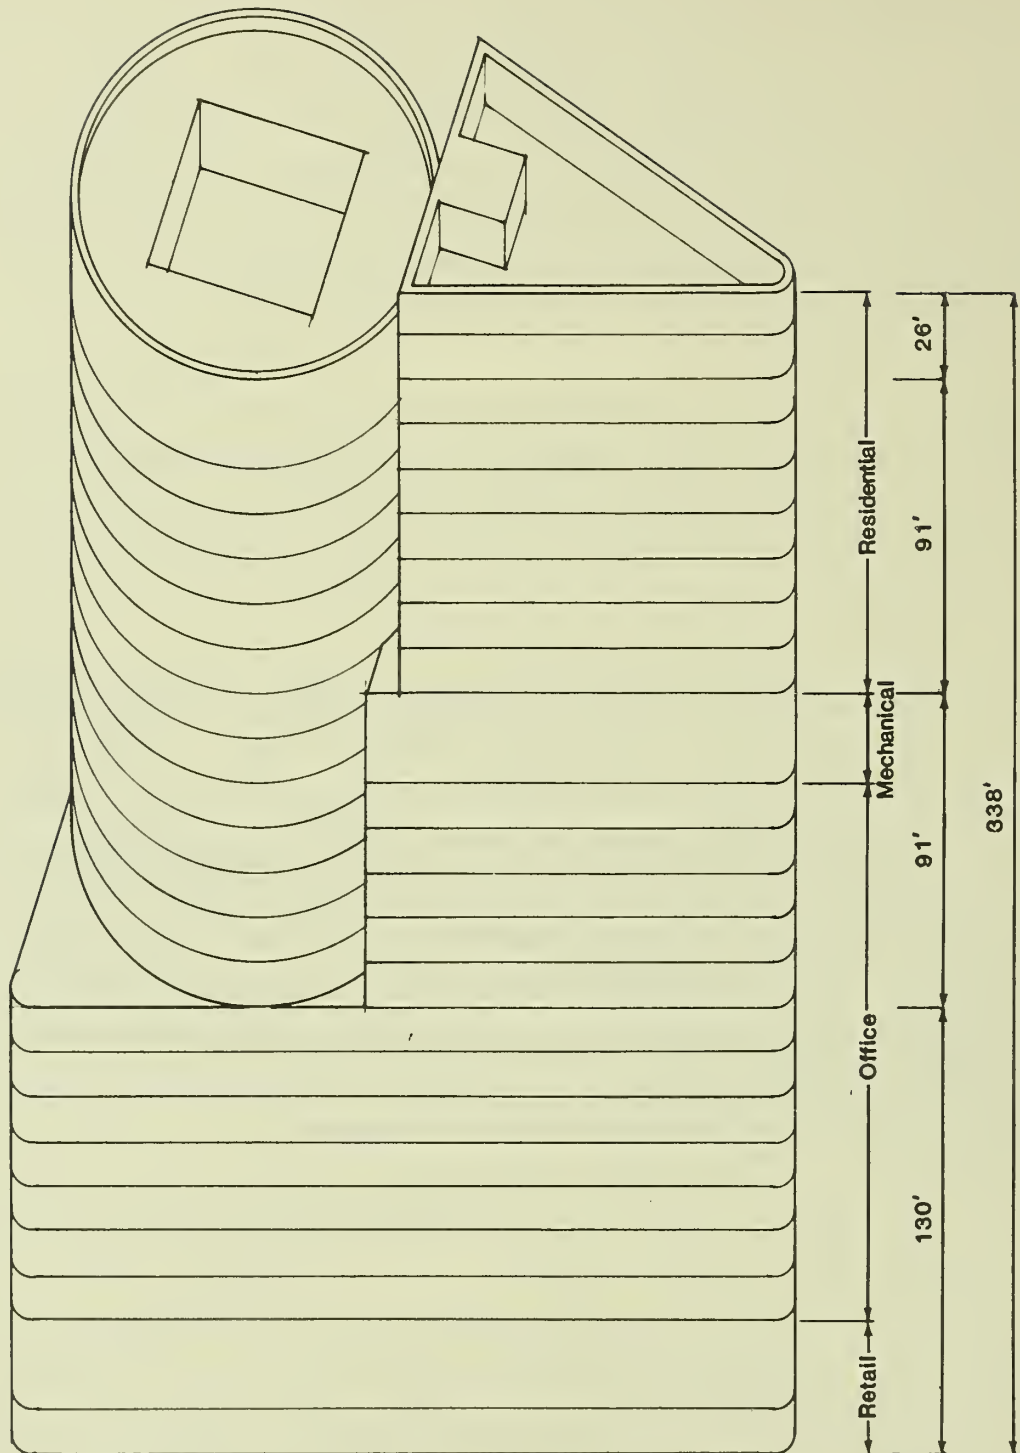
Alternative Three- Guiding Downtown Development Alternative
